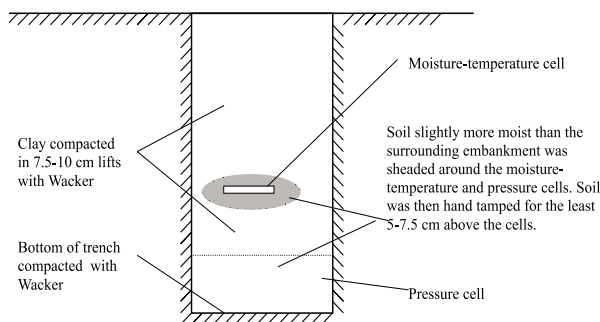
Pressure cell installation detail in railway subgrade [6]
